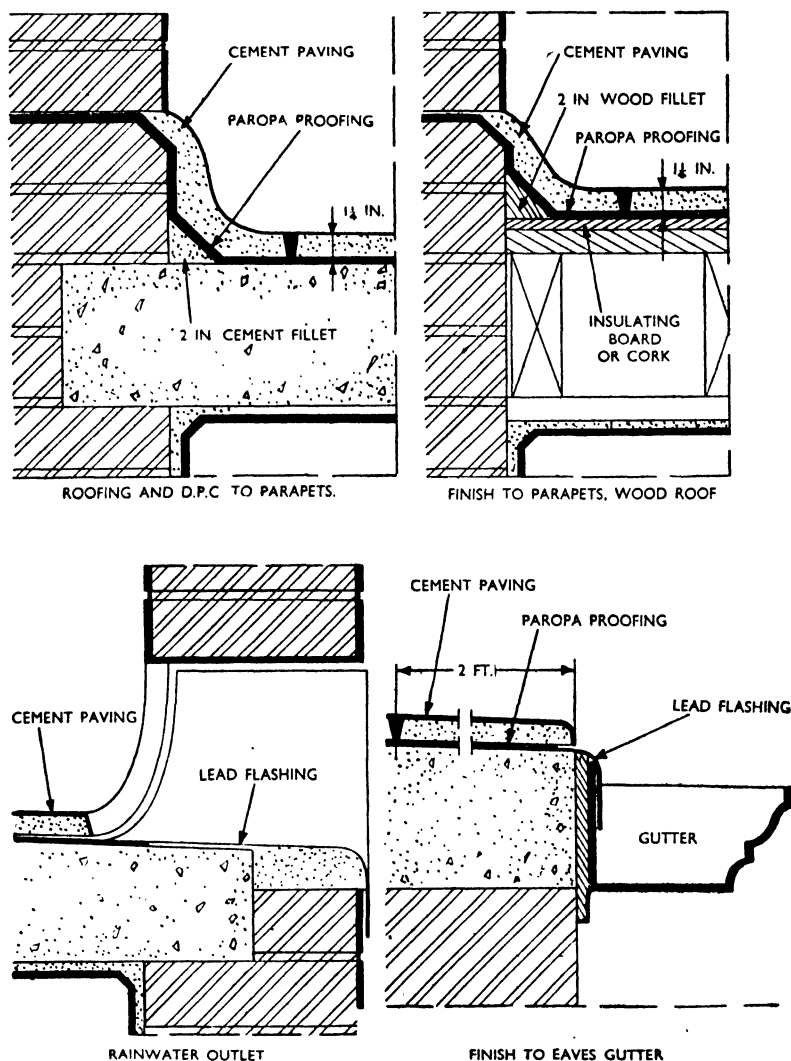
Paropa patent roofing giving details of the suggested method of finishing the covering materials at parapets, outlets and eaves.
